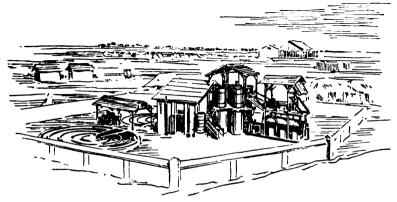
Sketch of water supply installation at Ferdan, December 1916.
